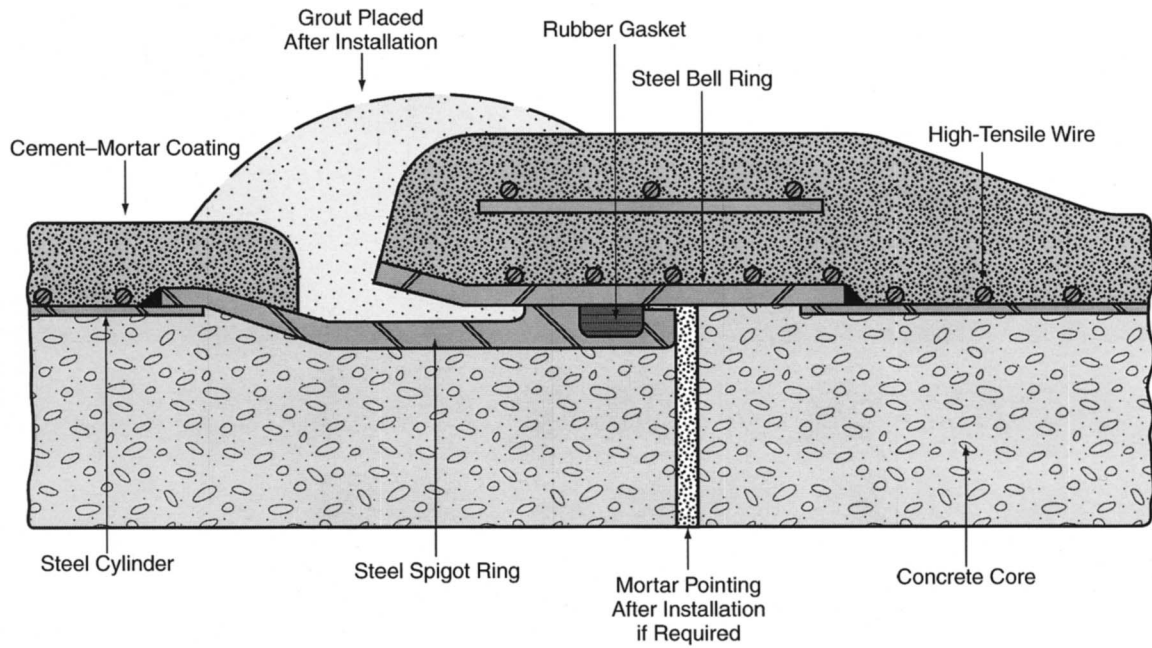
Prestressed concrete-lined cylinder pipe (AWWA C301-type pipe)
